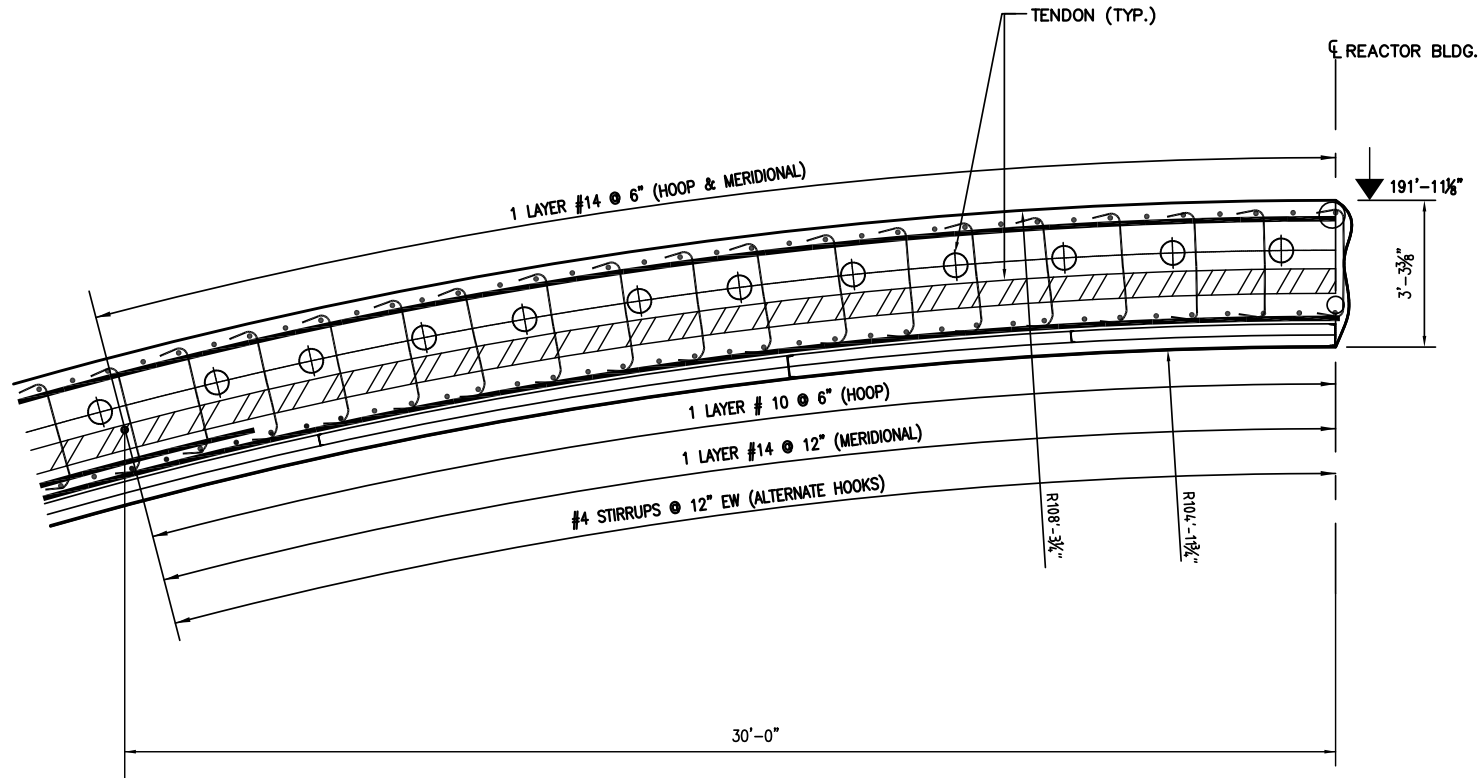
E.1.3-13—Reinforcement Details for the RCB Dome Subcomponent GH
